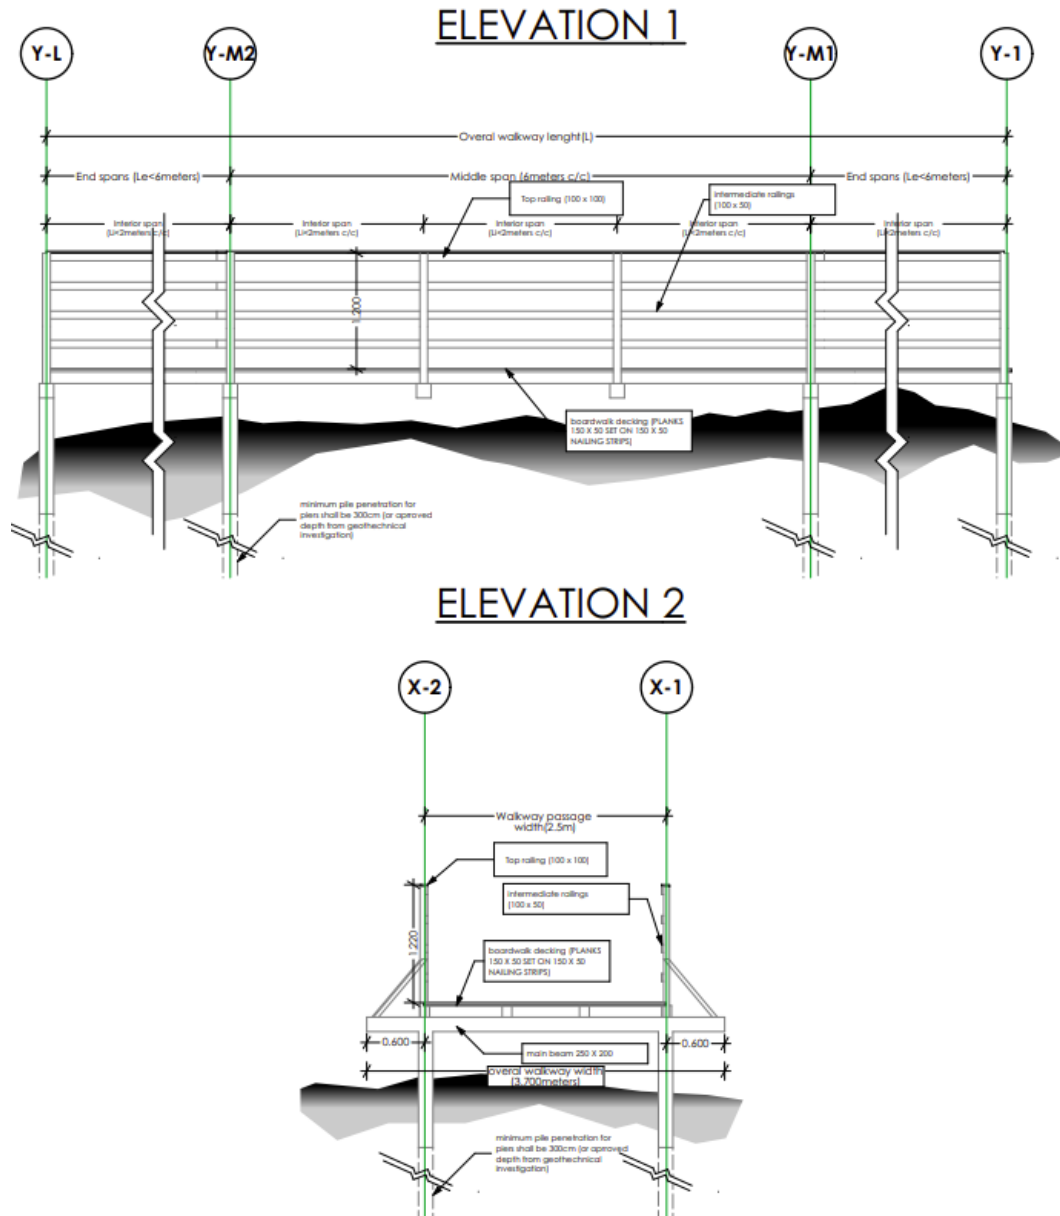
SUSPENDED WALKWAY IN GIKONDO
